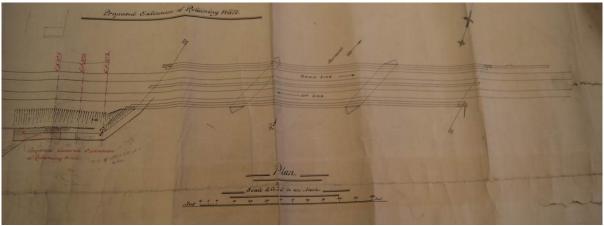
Concrete retaining wall, Camerton Bridge (DHAM/7/2)
